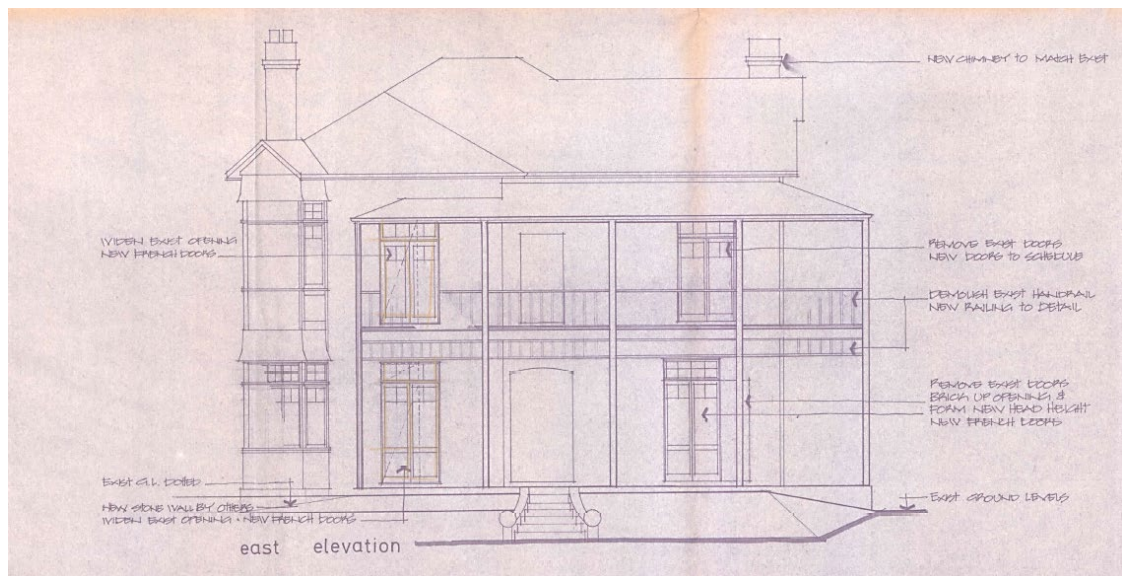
Approved plans 1983 plans showing the layout of the house and proposed works.
